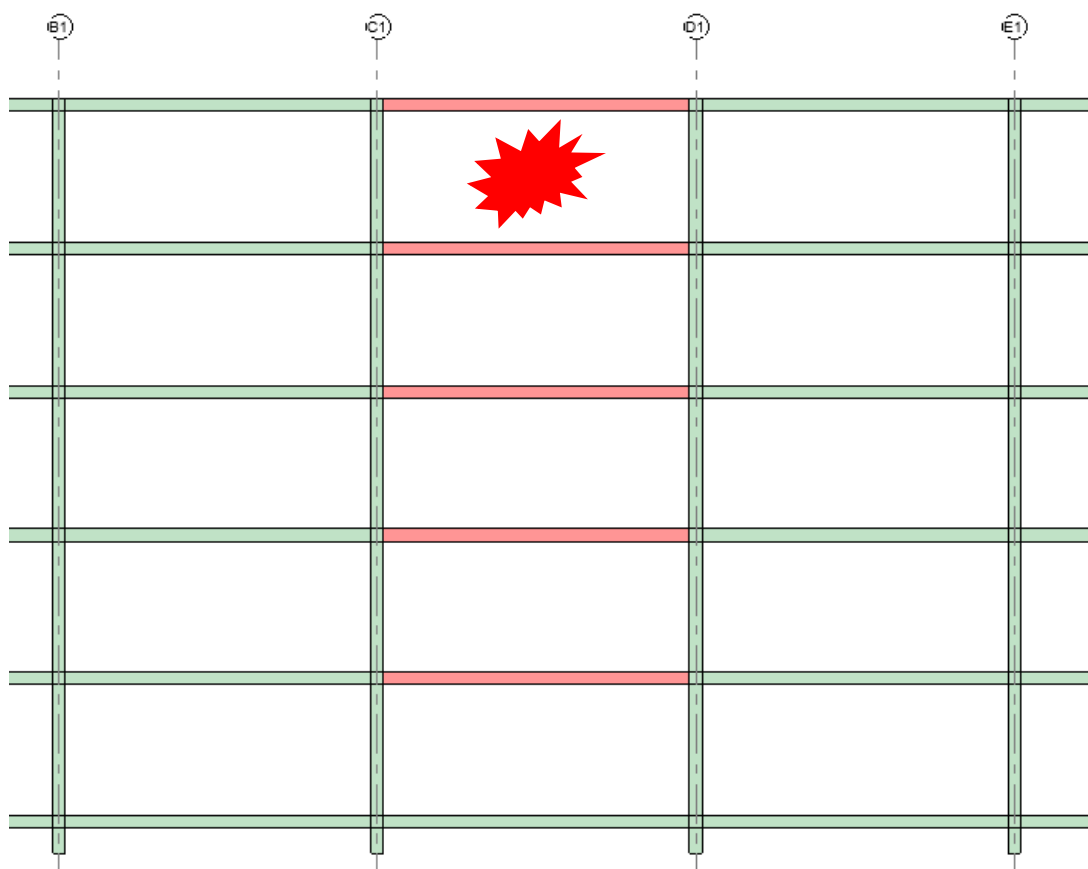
Collapse mechanism if fire event occurs within top flat, Charleton house (elevation)
